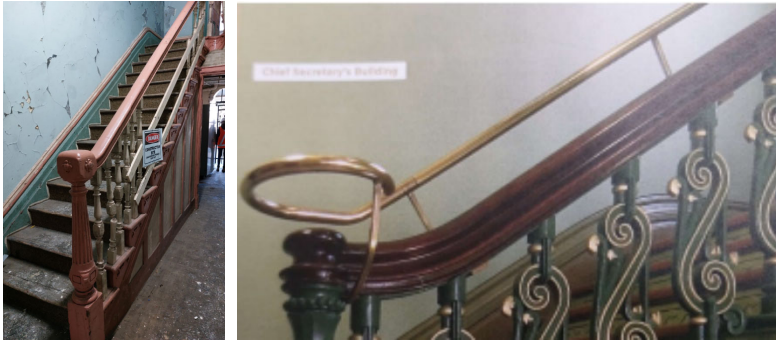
Similar example of additional railing added on top of non-compliant timber handrail.
